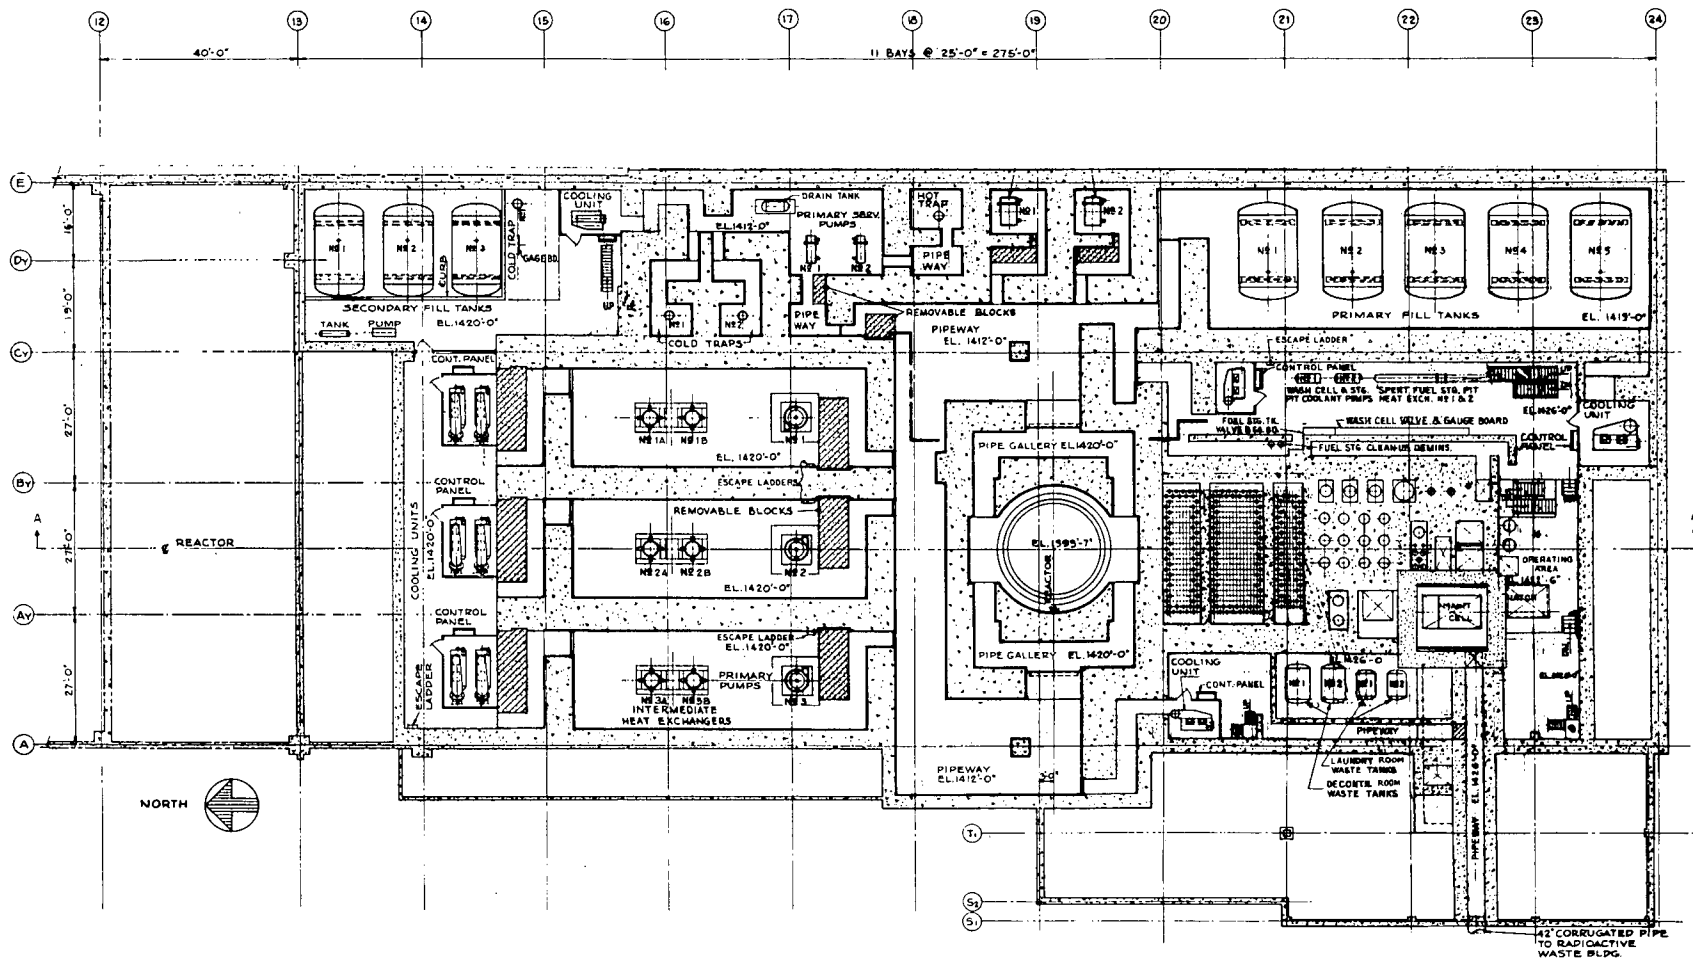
HNPf - Reactor Building Layout Plan Below Elevation of 1440 ft.
